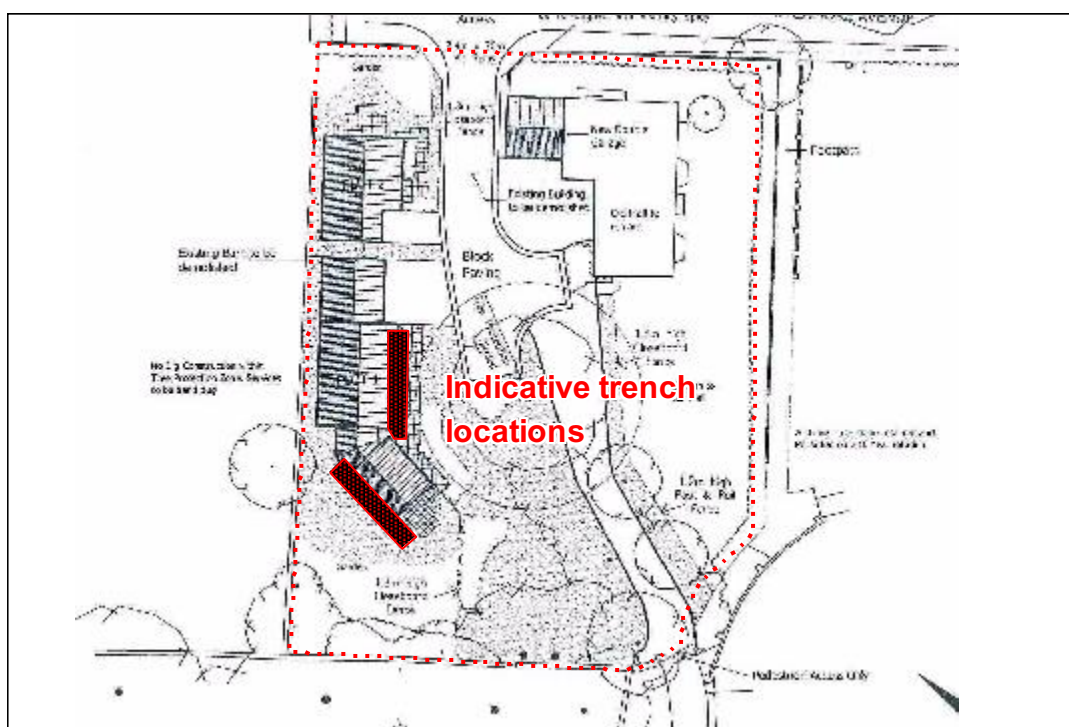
Plan indicating possible trench locations (from 'breif Fig 4)
